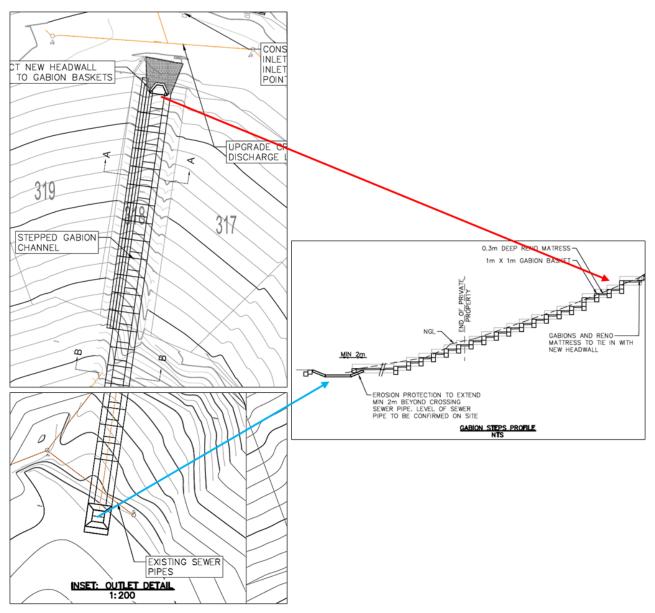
Erosion Protection for erven 318 & 139 (Plan & Section View) – stepped gabion channel ending with a stilling basin approx. 2m beyond the existing sewer pipeline.
